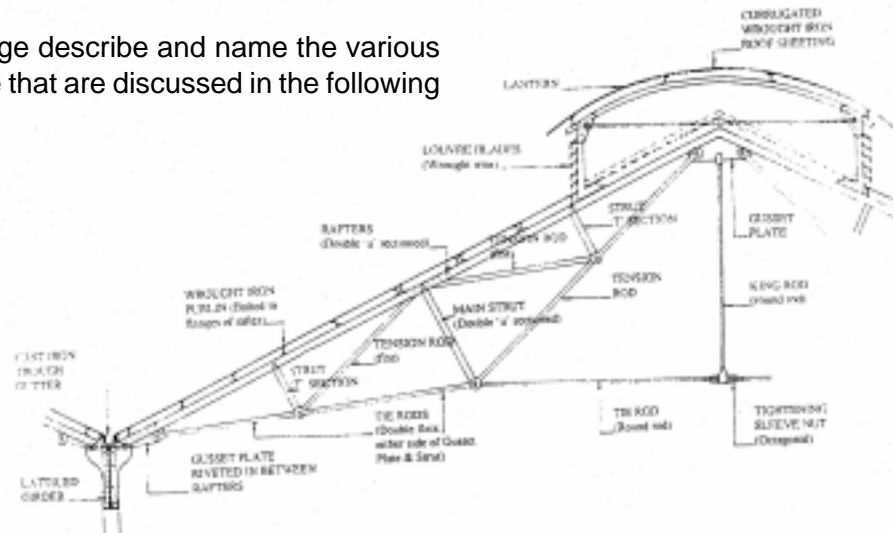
Sectional elevation A. Part elevation of principal truss. Source: OC+P
